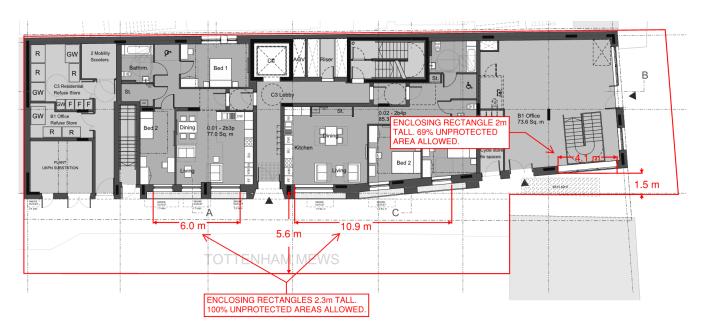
Permissible unprotected areas on the east elevation at ground level
